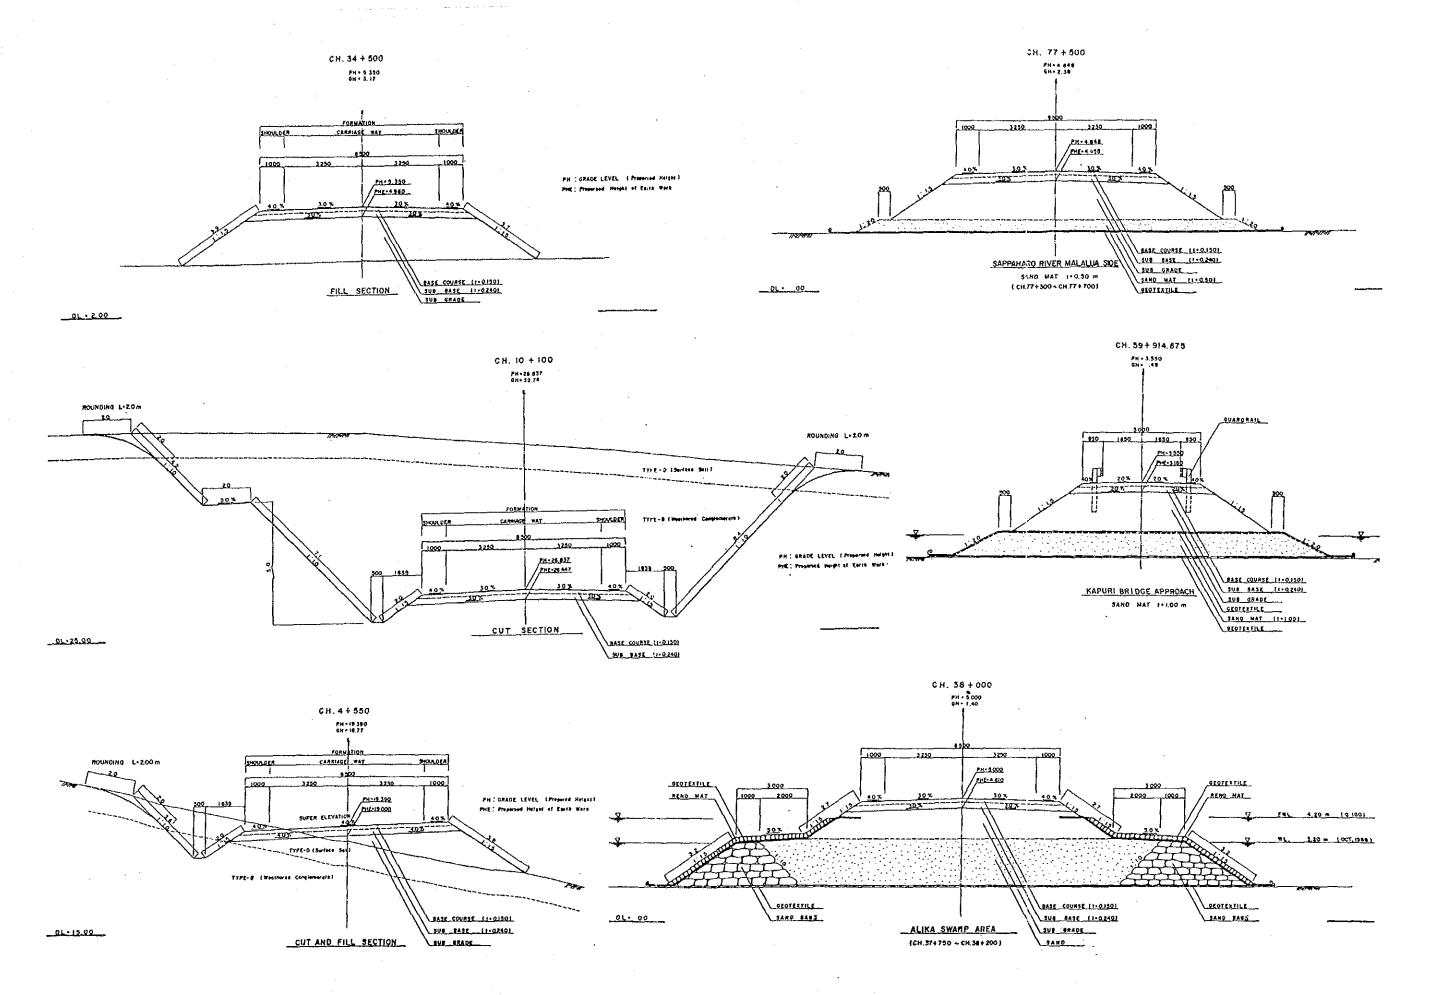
TYPICAL CROSS SECTIONS OF CUT & FILL AND SOFT GROUND
